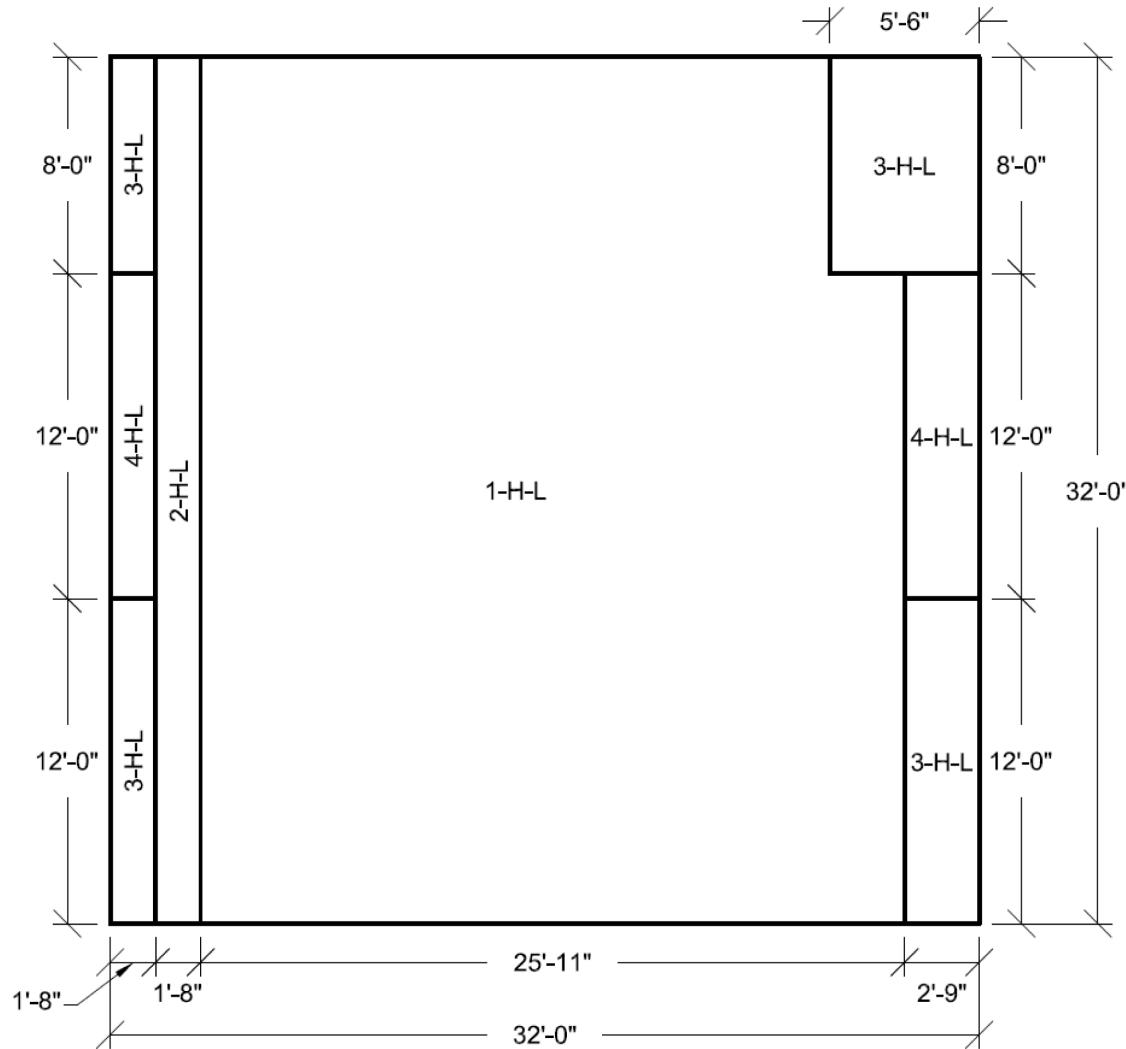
H.6-190 DGFOSV Wall 13 Looking From Outside Horizontal Reinforcement Zones Near Side Face
